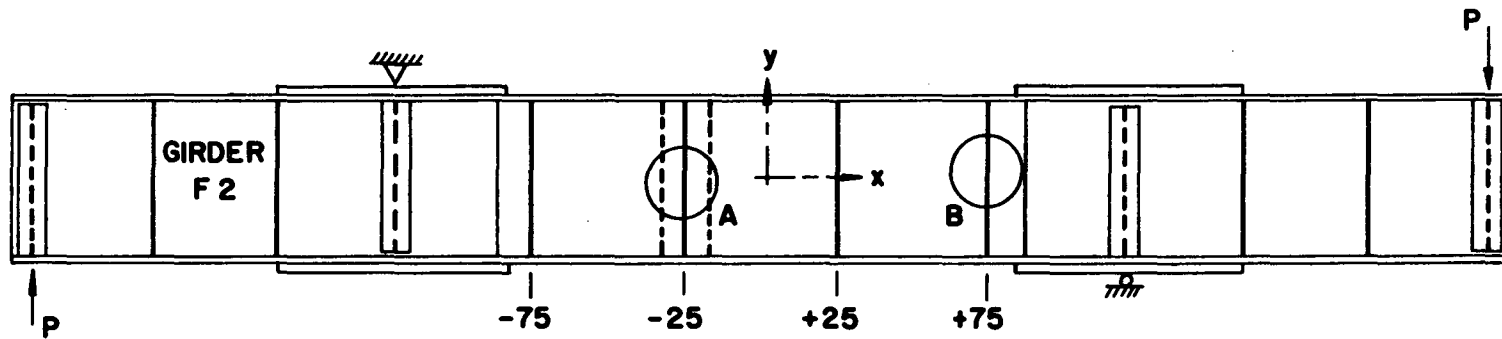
Crack Location and Repairs, Girder F 2
